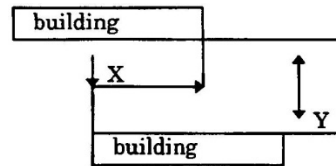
Typical Minimum Distance between Parallel or Nearly Parallel Building Walls of Single-Family Attached Dwelling Buildings
